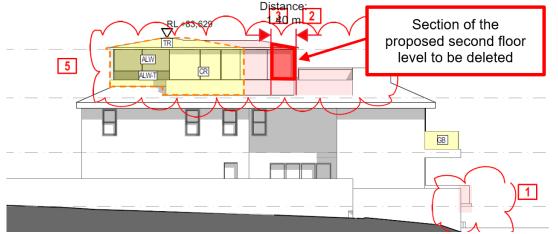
North-west elevation showing the area of the second storey level which is to be deleted
